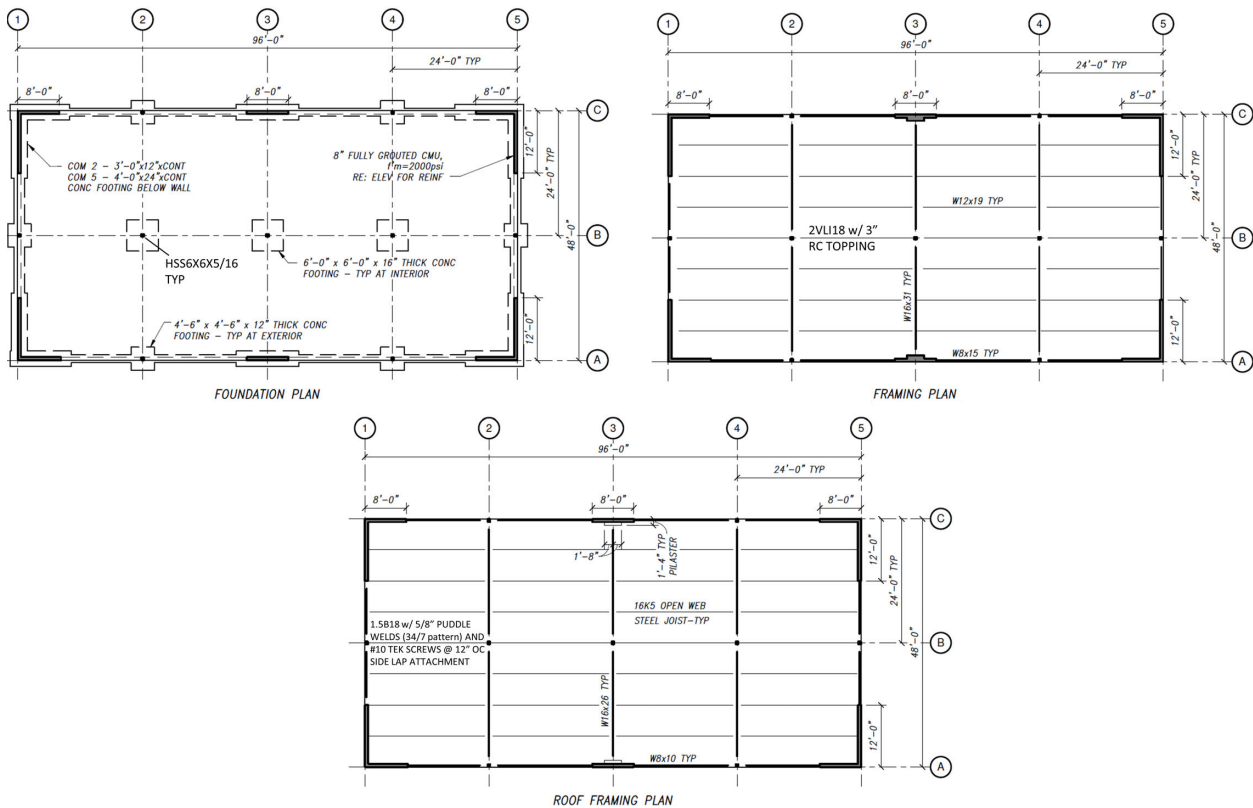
Foundation plan, floor framing plan, and roof framing plan of the commercial building archetype (courtesy of Dr. G. Kingsley).
